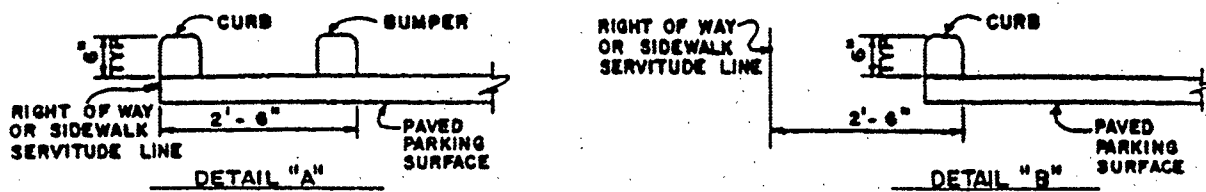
PARKING DESIGN DETAILS—CURBING AND WHEEL STOPS
